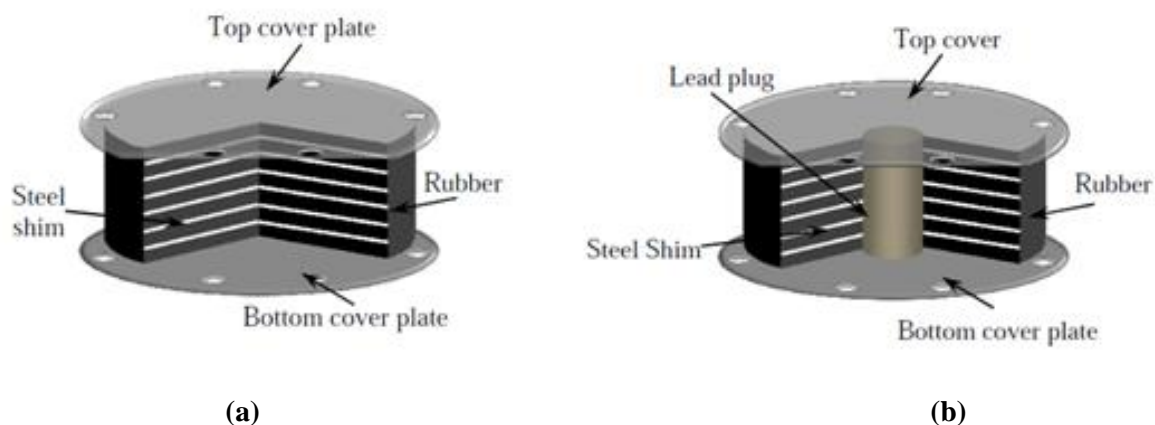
a) Laminated Rubber Bearing b) Lead Rubber Bearing
